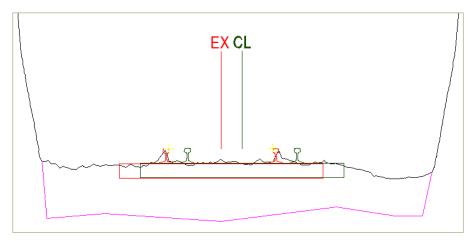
CH 135.464KM profile of tunnel floor relative to existing and design rail levels
